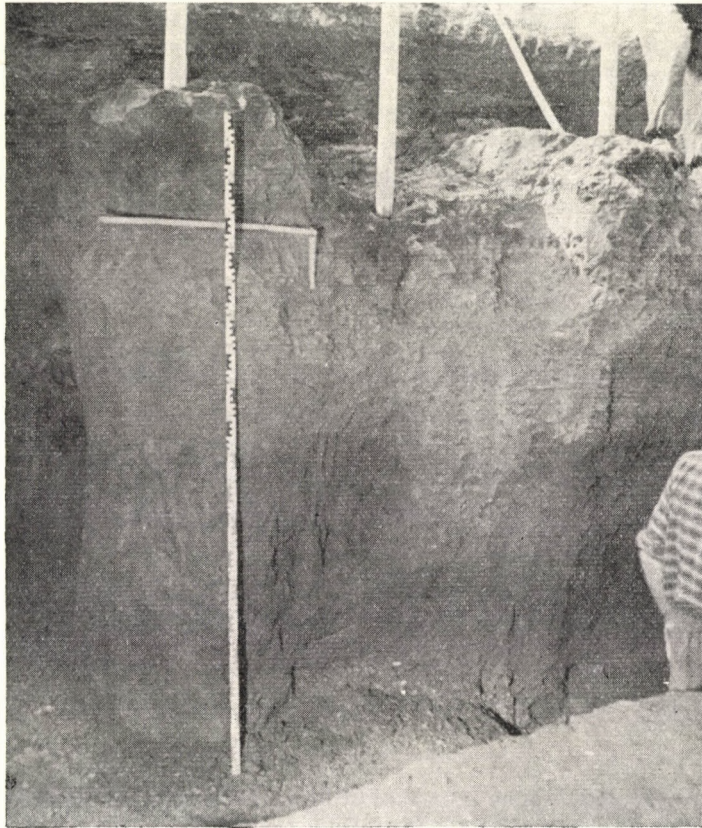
Stabilized soil columns around the grouting pipes in the excavated pit
